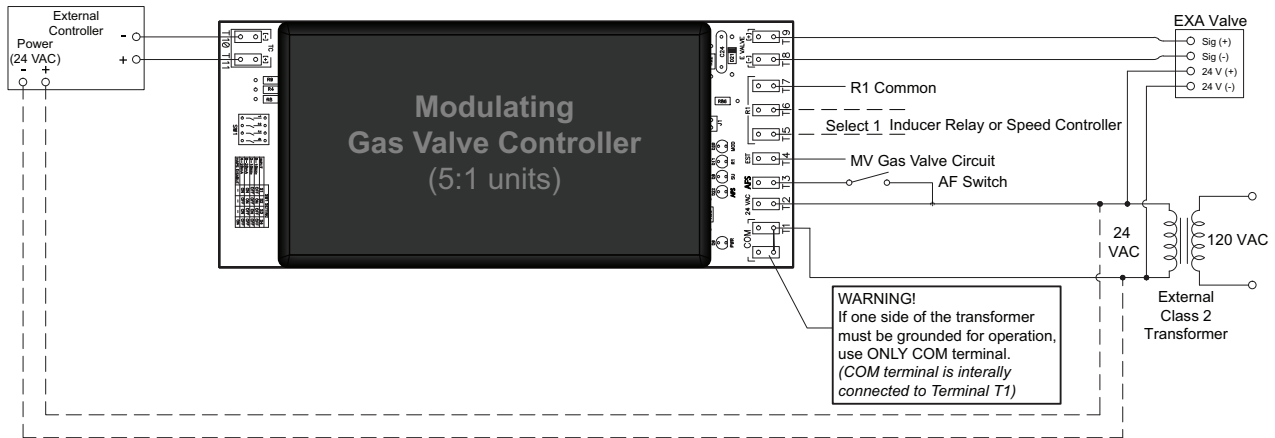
Modulating Gas Valve Controller (5:1 units) — Wiring Diagram
